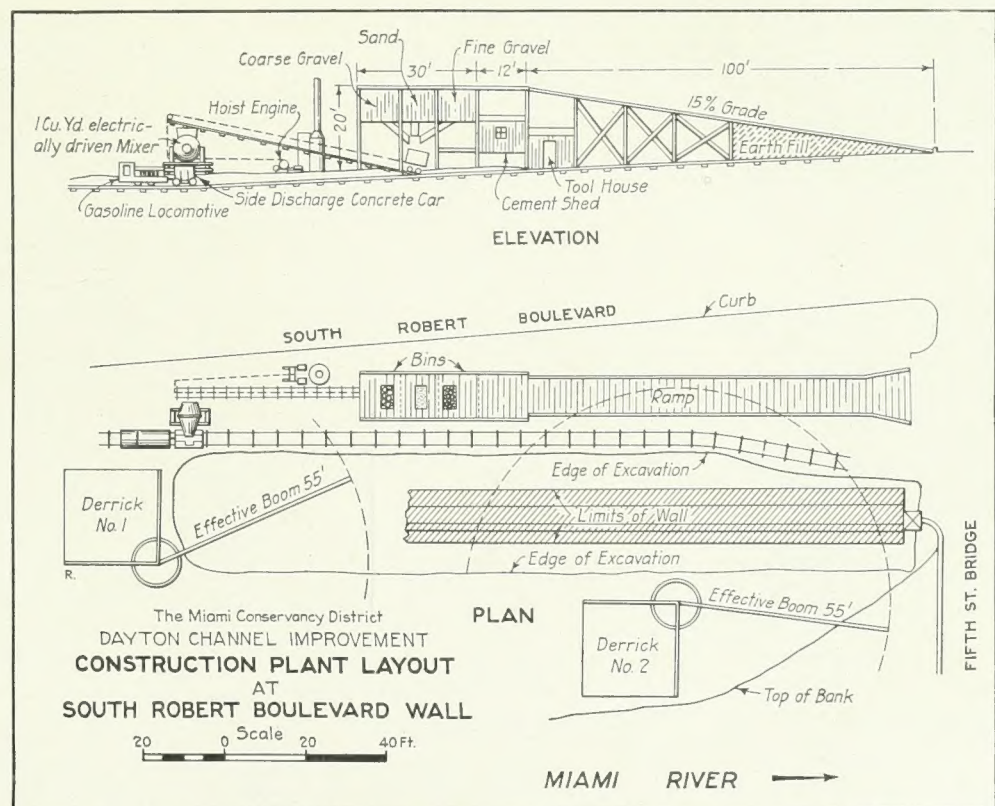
CONSTRUCTION PLANT LAYOUT AT ROBERT BOULEVARD WALL.
